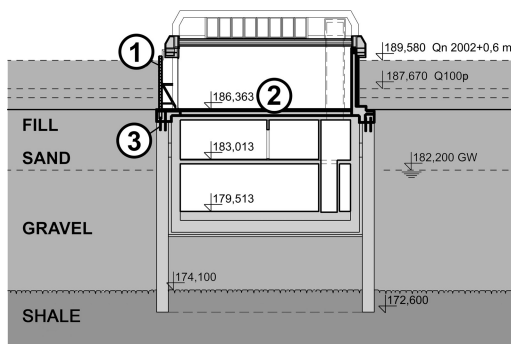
Incorporation of the weight of the diaphragm walls into the weight of concourse structure – Křižikova metro station. 1. Mobile barriers, 2. Thickening of the roof structure, 3. Sills joining the diaphragm walls to the concourse structure.
